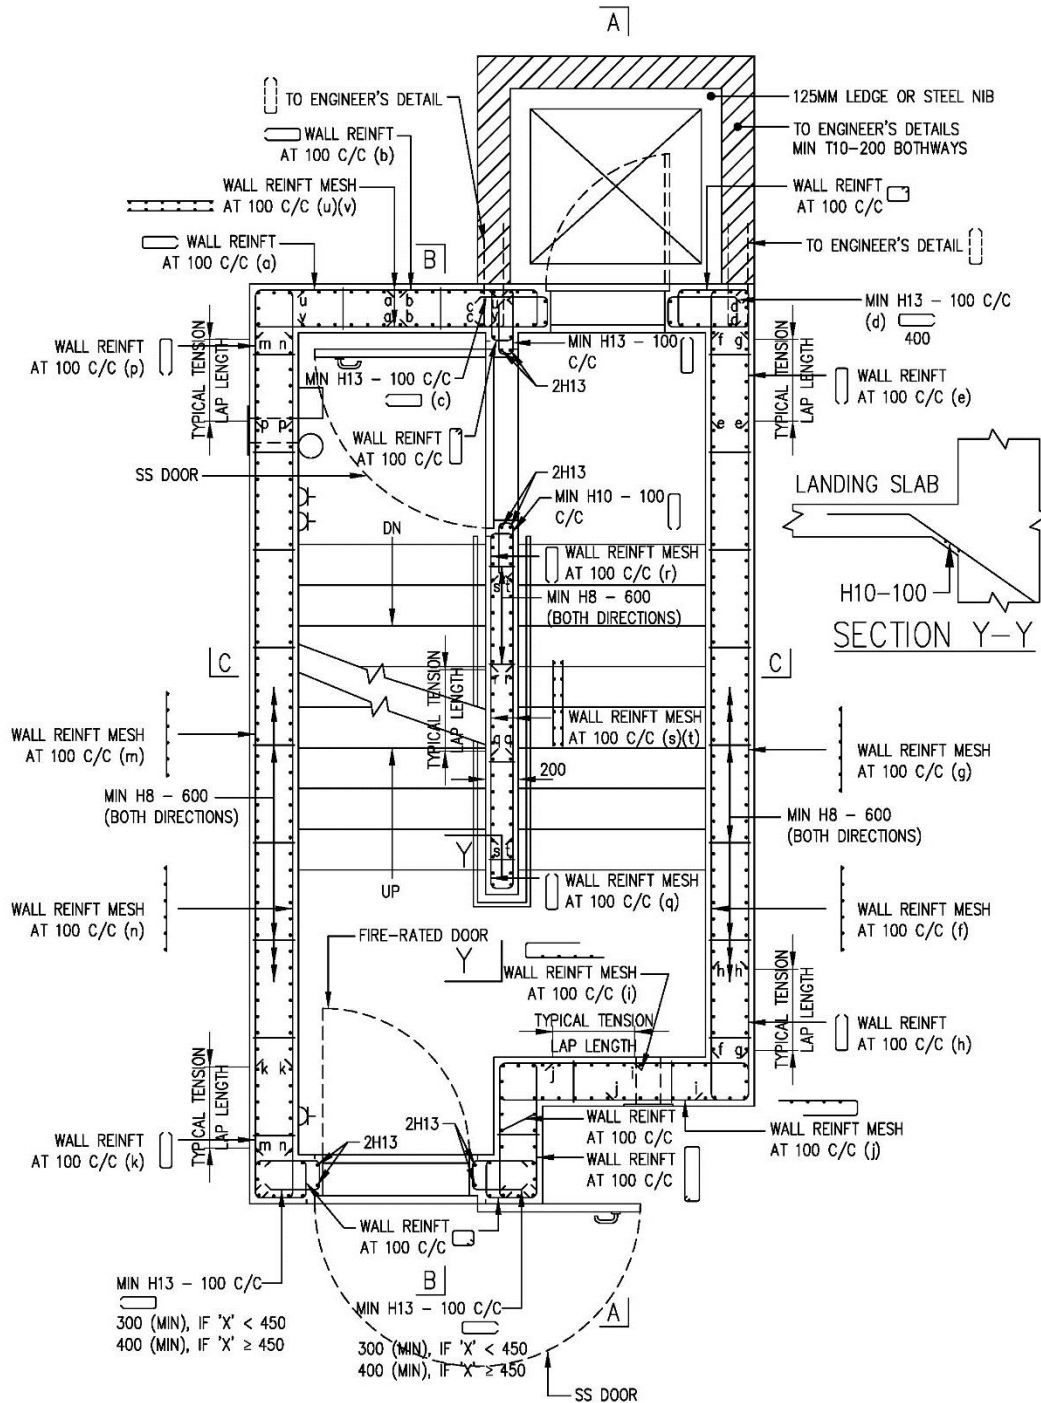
PLAN OF STAIRCASE STOREY SHELTER
